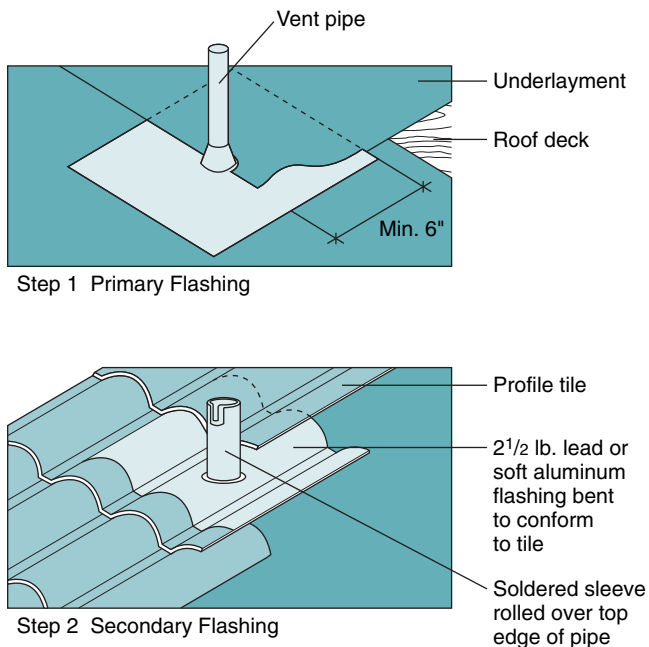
Pipe Flashings for Tile Roofs.
